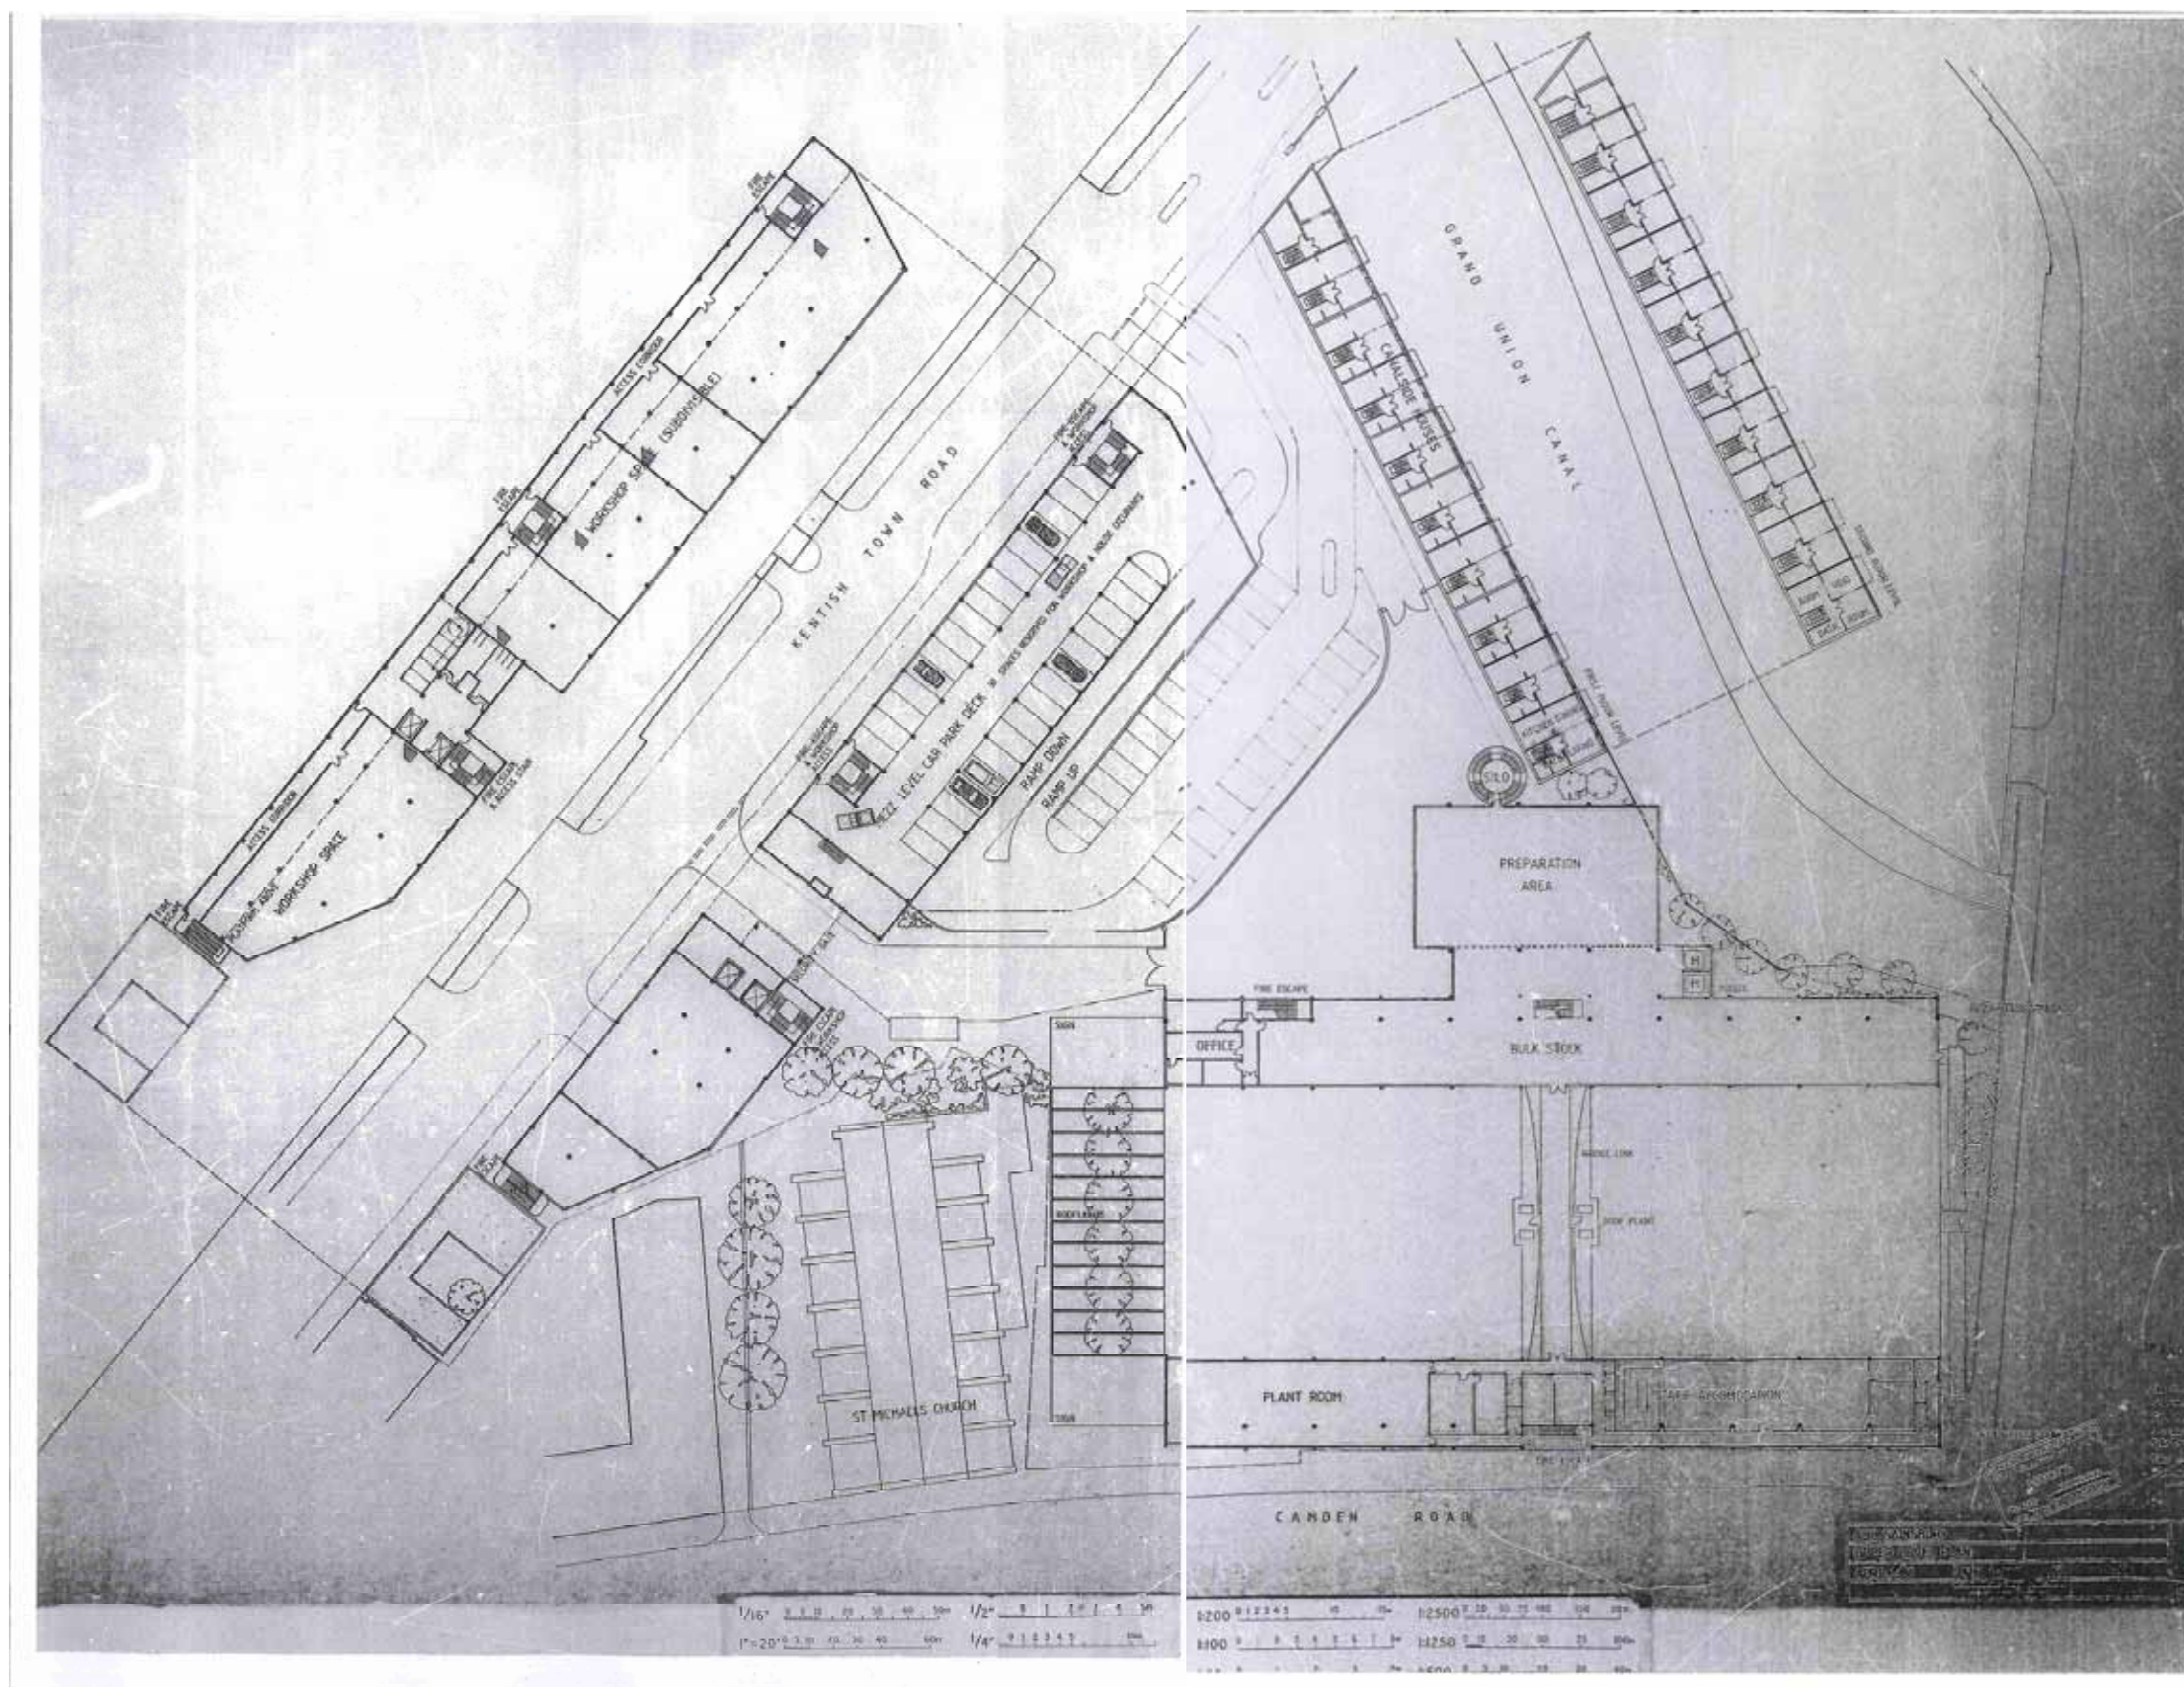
1986: Upper ground floor plan of the proposed Sainsbury's development on the former ABC site
